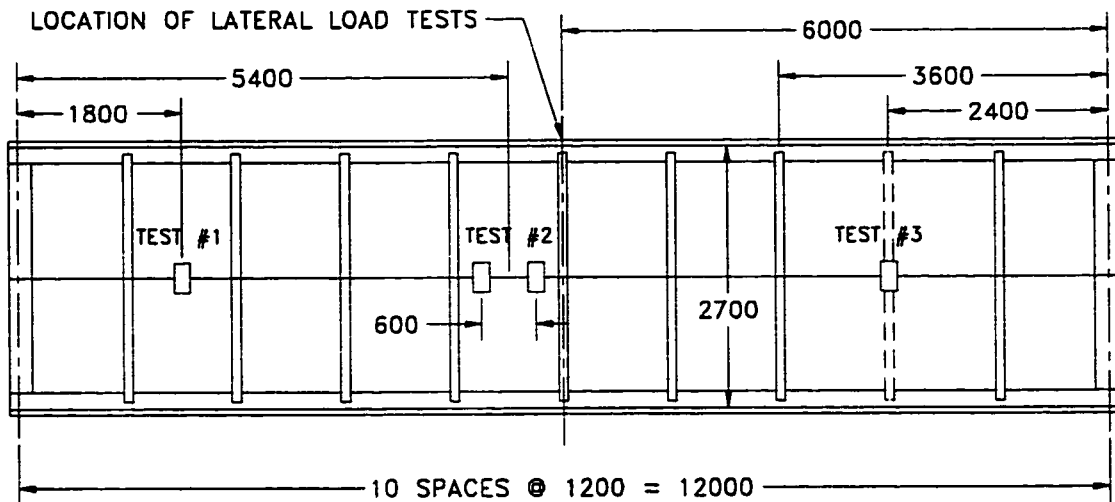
Plan View: Location of Load Tests (Newhook *et al.*, 1996)
